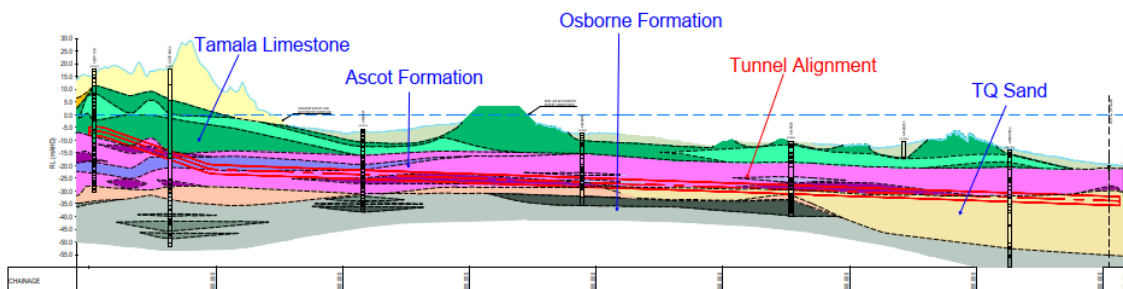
Outfall tunnel alignment (Intake tunnel is similar but shorter)
